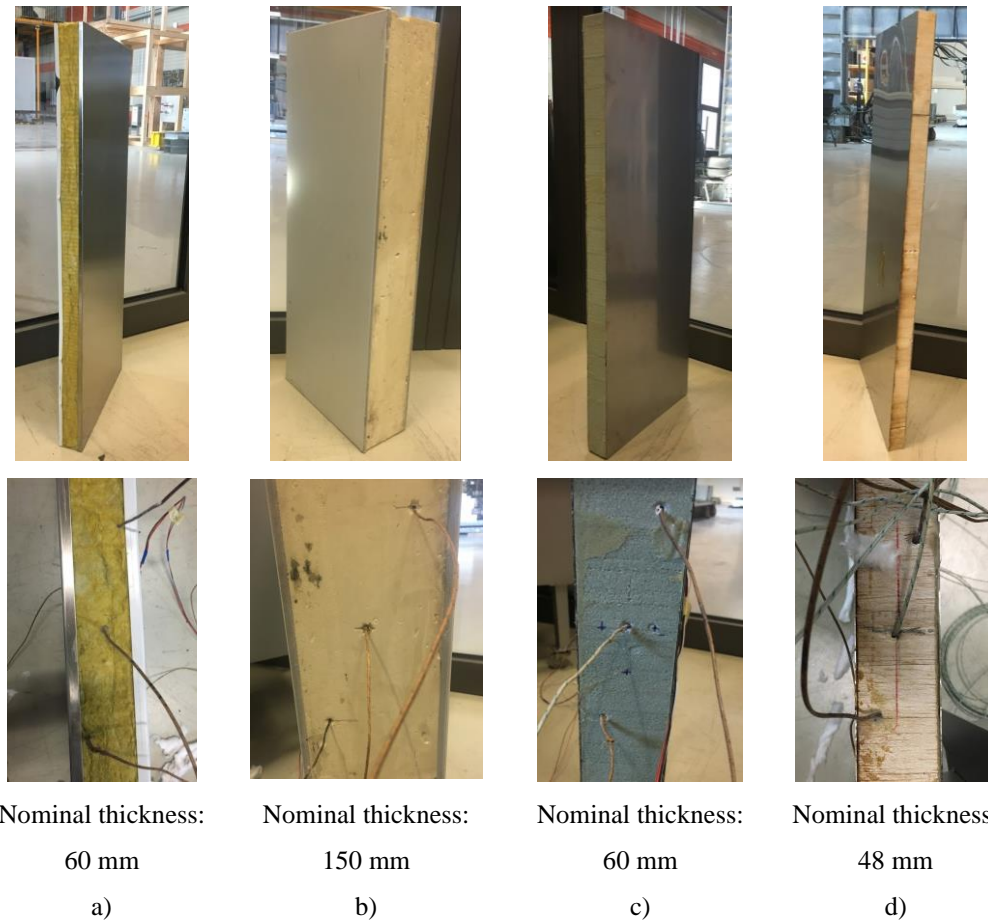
Photographic record of the test specimens: a) MW core; b) PUR core; c) PET core; d) Balsa wood core.
